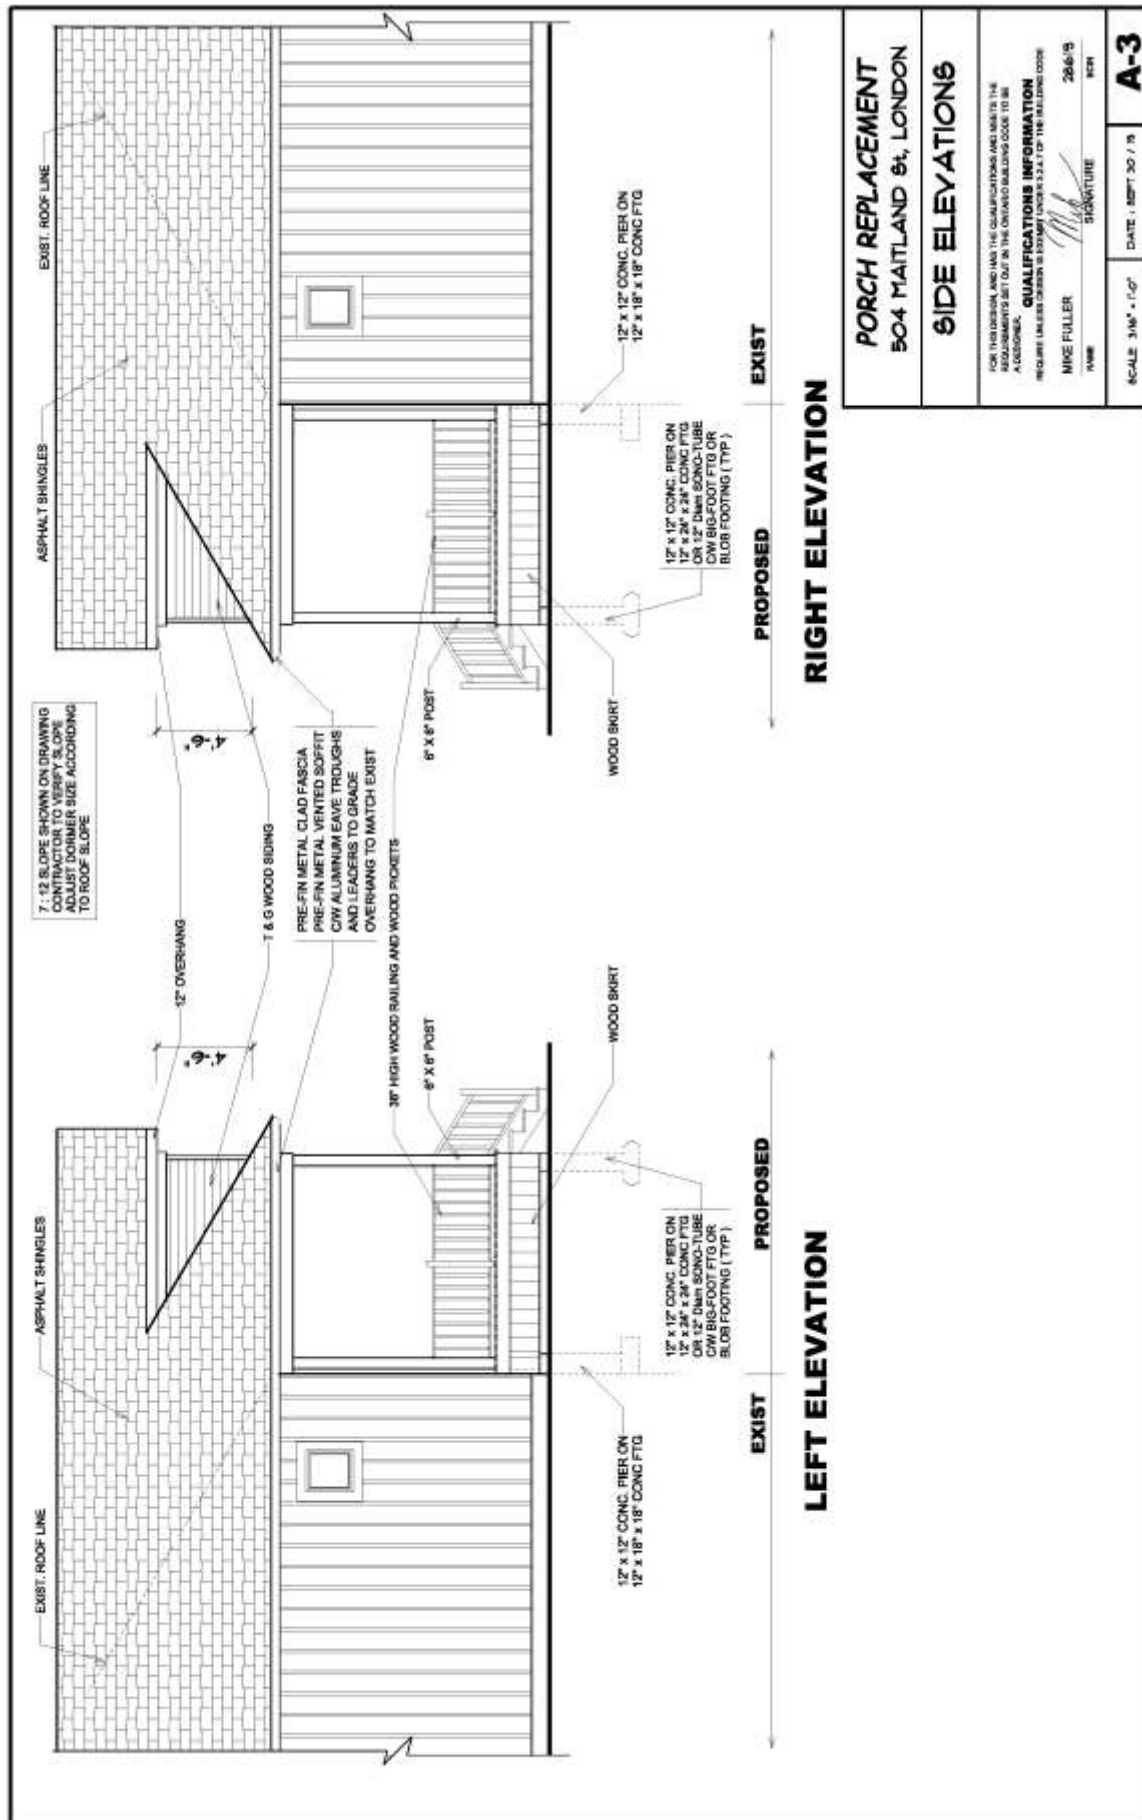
Side elevations of the proposed porch alteration and proposed dormer for the existing semi-detached dwellings at 504-506 Maitland Street.
